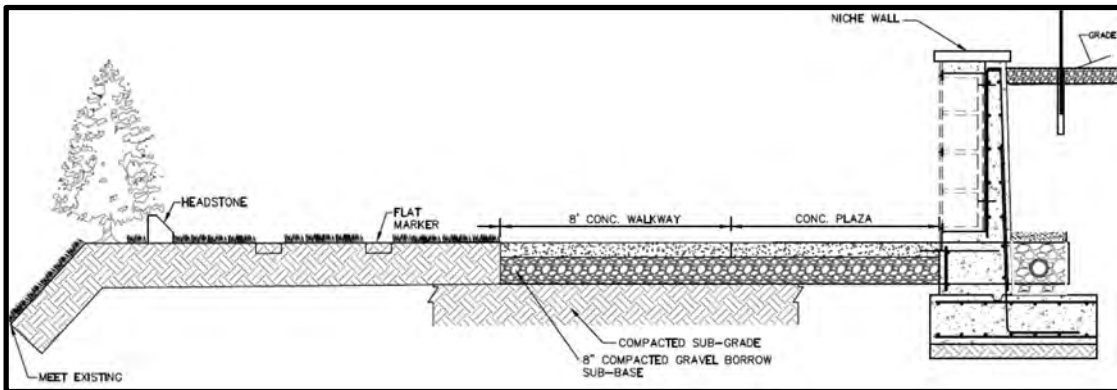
Area 12 Expansion Cross Section A-A
